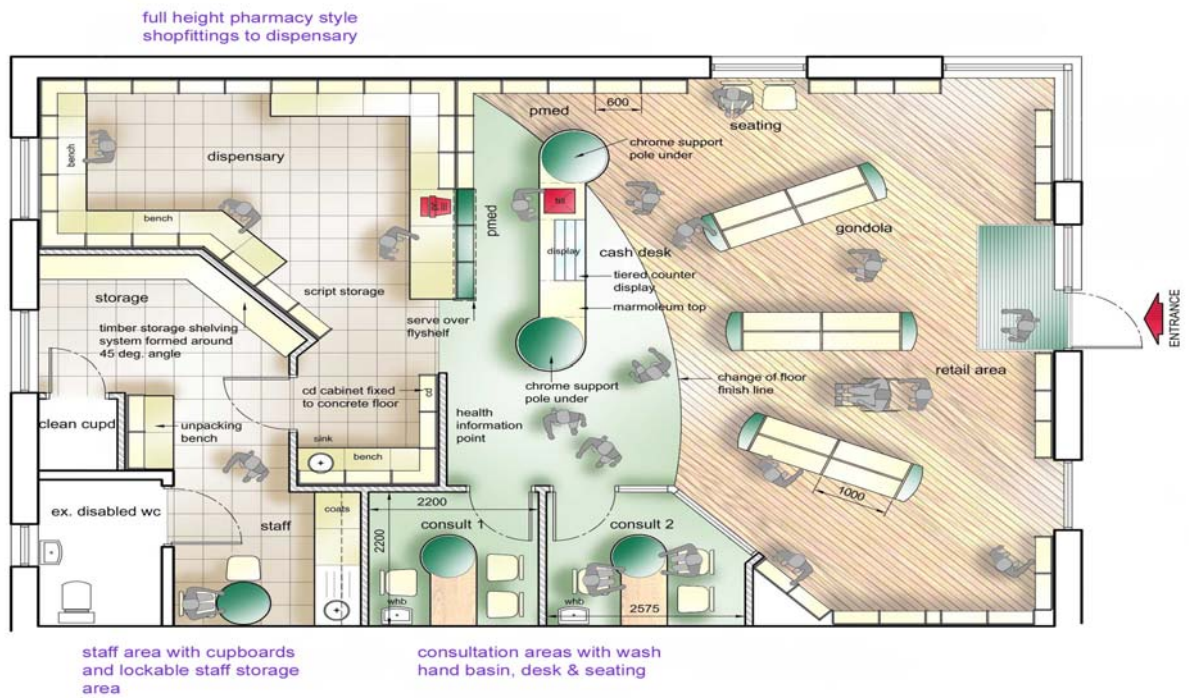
Example of Typical Large Pharmacy Premises – Floor Plan
